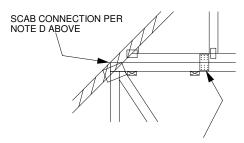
DETAIL IS NOT APPLICABLE FOR TRUSSES TRANSFERING DRAG LOADS (SHEAR TRUSSES). ADDITIONAL CONSIDERATIONS BY BUILDING ENGINEER/DESIGNER ARE REQUIRED.
